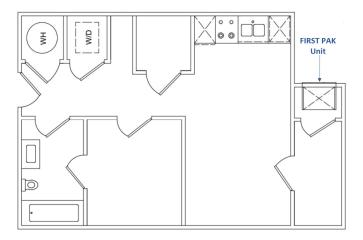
Typical Floorplan with FIRST-PAK on Exterior Wall
